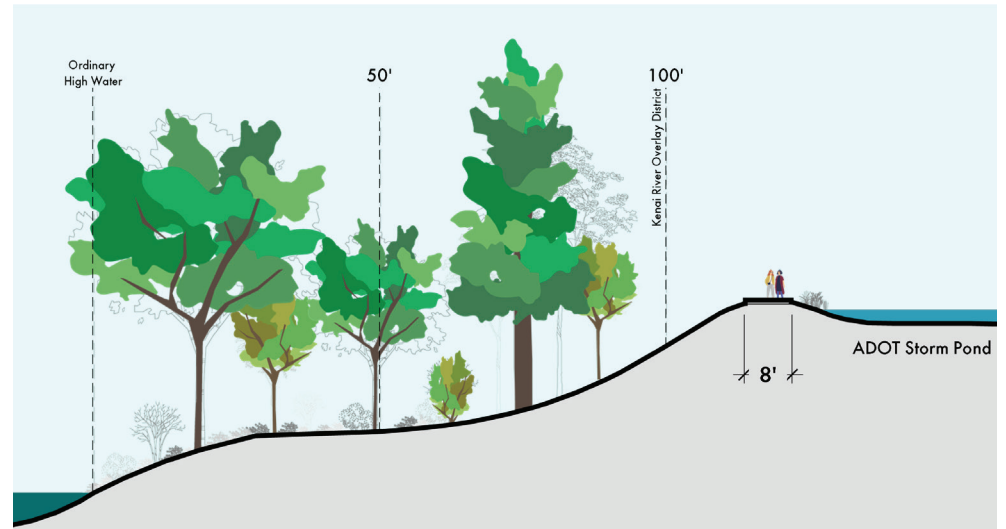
Proposed Section: Multi-Use Trail and Easement (AK DOT&PF Pond)
